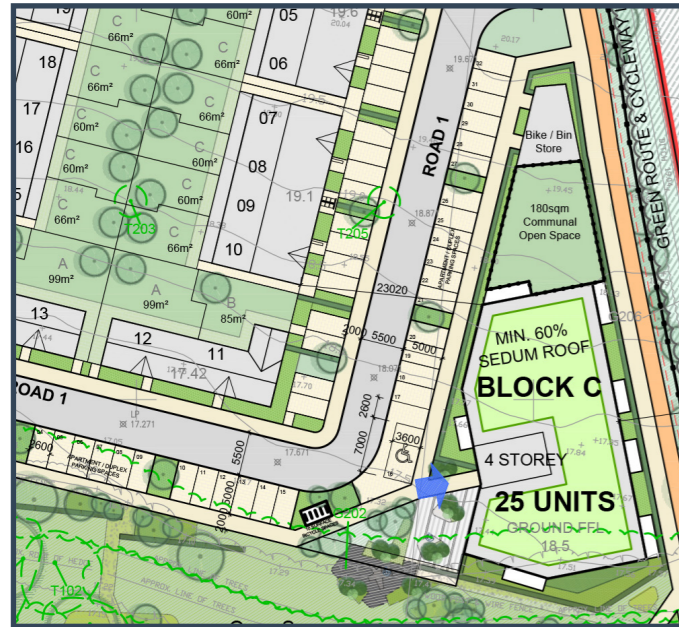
Single apartment building layout, community space and parking arrangement. Source: MCORM, 2022.
